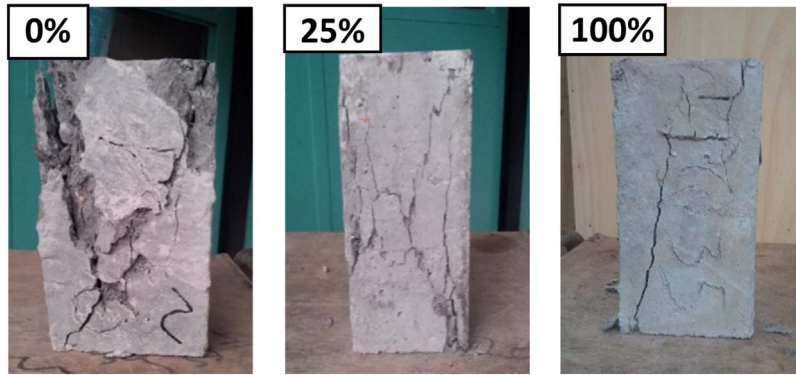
Failure patterns of concrete with 0%, 25% and 100% sand replacement.
